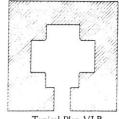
Example of house plan offered by the Northwestern Division of the A.S.H.S.B. in 1923
